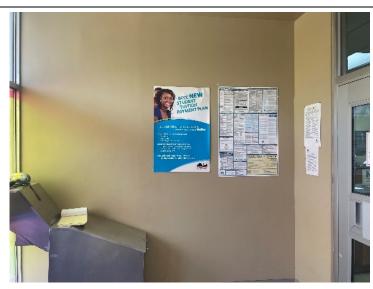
View of tan/beige LBP in the main entrance to the first floor of the subject building.
